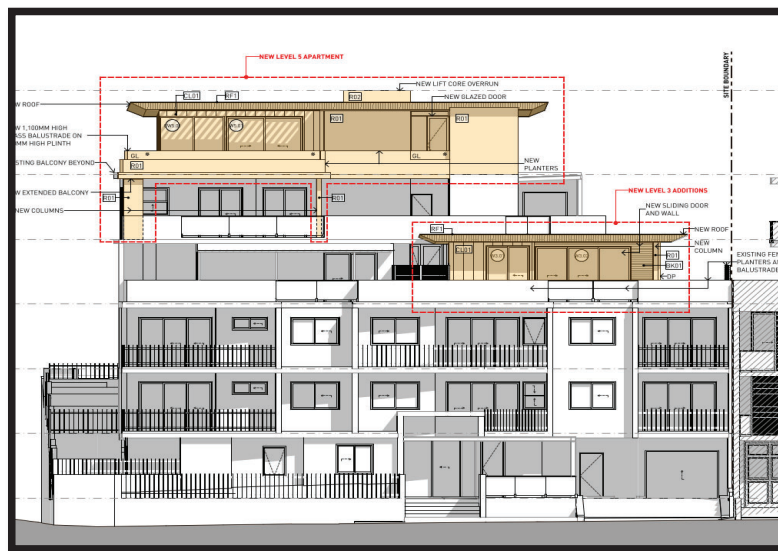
Elevation view from Farm Street. The proposed additions are shown coloured comprising an additional apartment (top left) to create new Level 5. This creates a covered area for part of the Unit 19 external courtyard. And extension of Unit 21 from a studio to 2 bedroom apartment (right).
